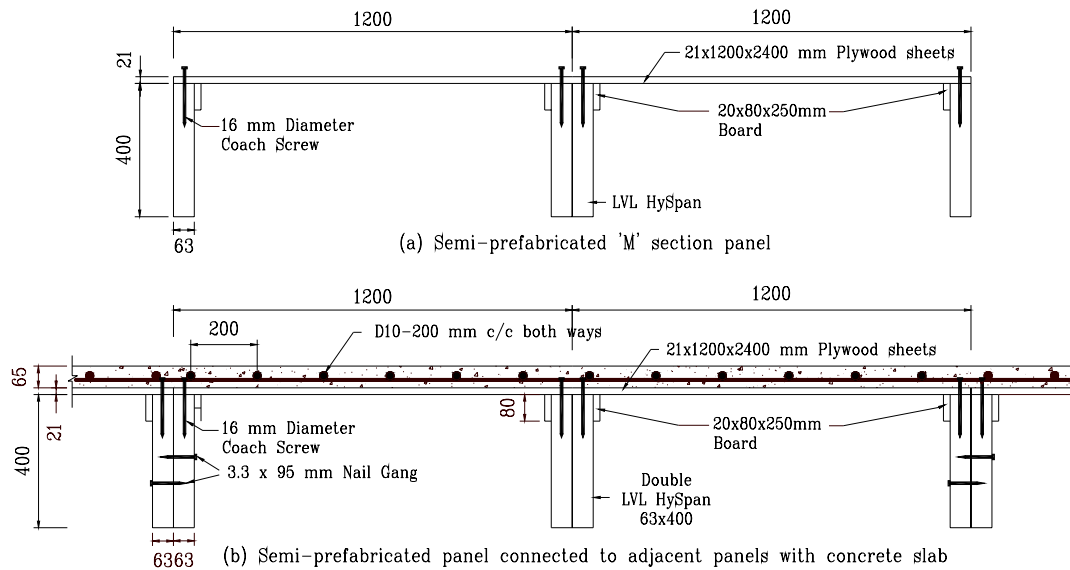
Semi-prefabricated “M” section panel (dimensions in mm)
